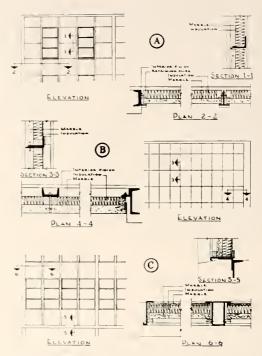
Detail Plate No. D from M.I.A. Standard Specifications showing section through Gulf Oil Building wall.
